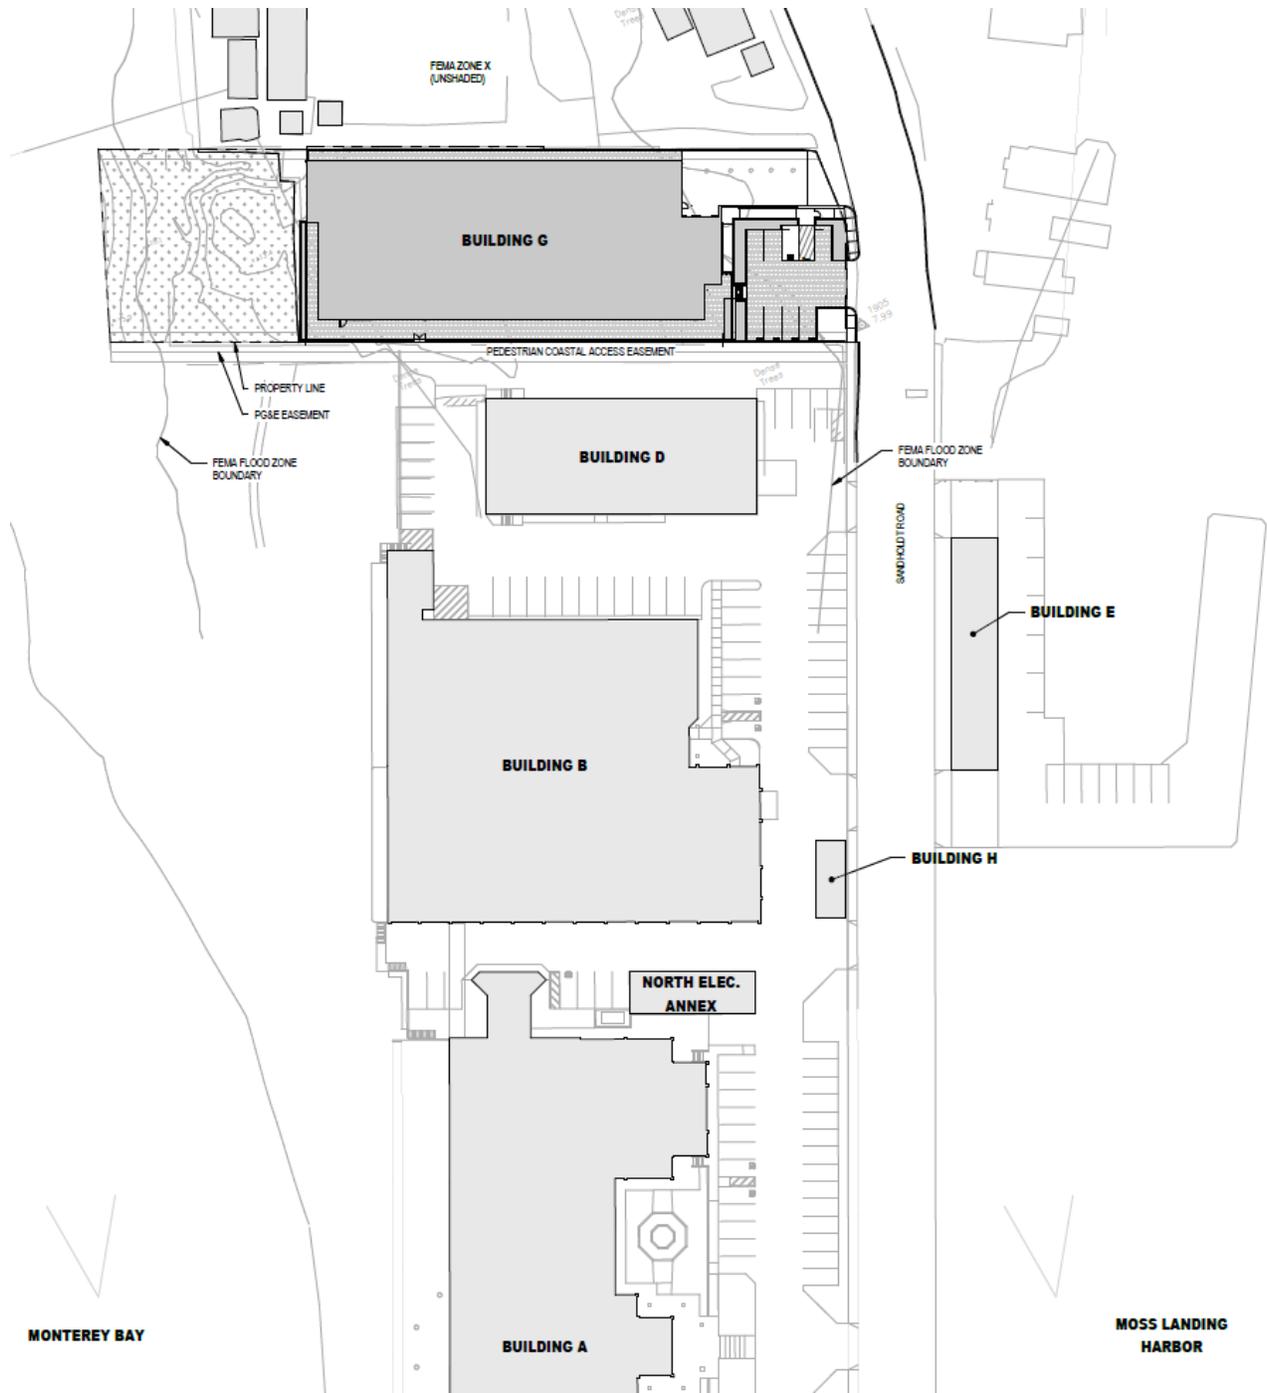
MBARI Campus Plan, depicting Buildings A, B, D, E, H, and the proposed Building G. (Source IX.1)
